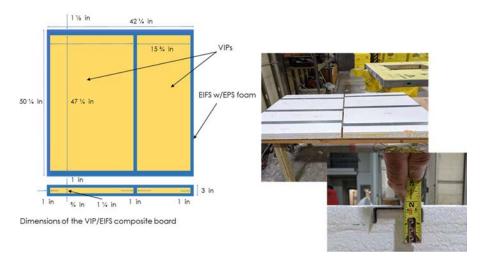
Construction details of the exterior insulation finish system/VIP retrofit panel (EIFS/VIP).
